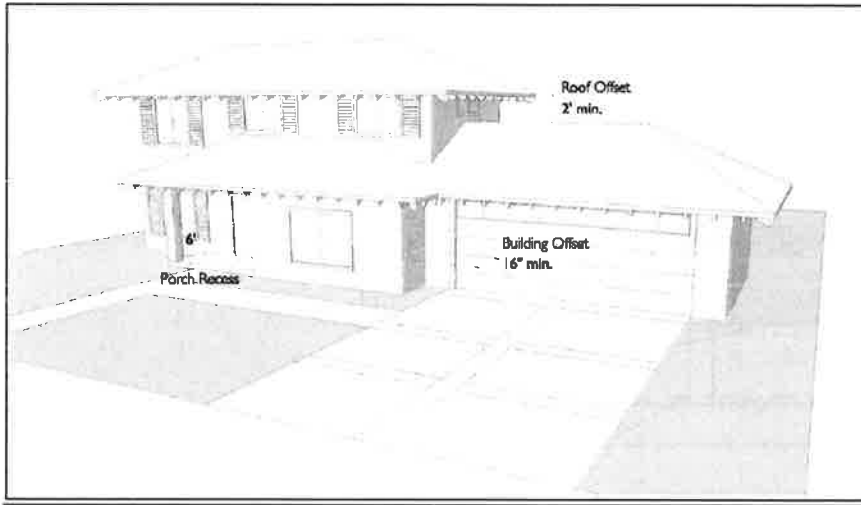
Example of Detailed Design -Townhome (2 elements required)
